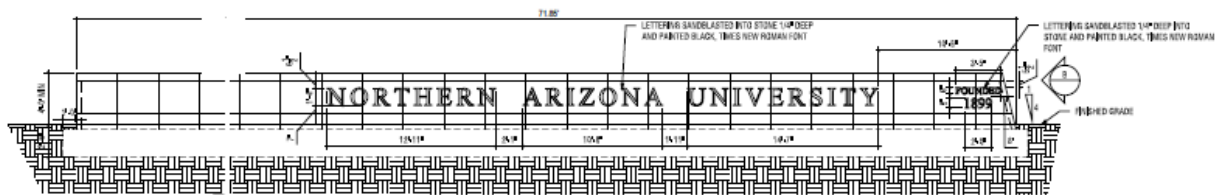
FIGURE M: EASTERN STONE WALL ELEVATION WITH SIGNAGE ELEVATION SOUTH FACE
